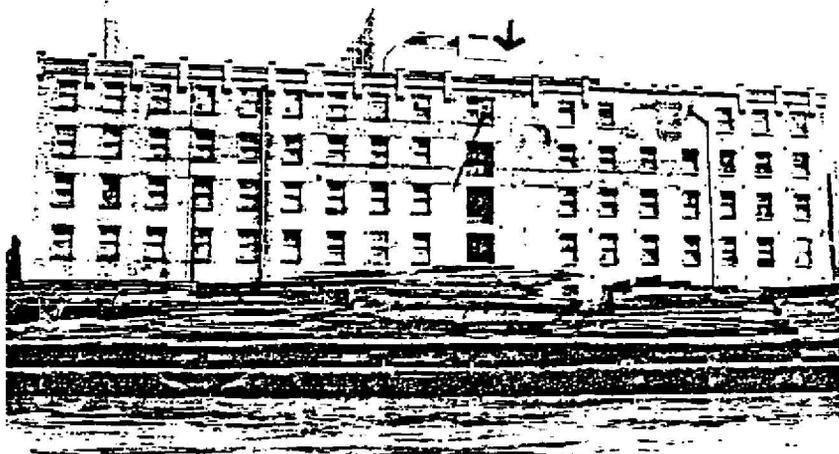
Building "S" of Mott Iron Works, looking east. Arrow points to division line between Building "A₁" and "A₂".
